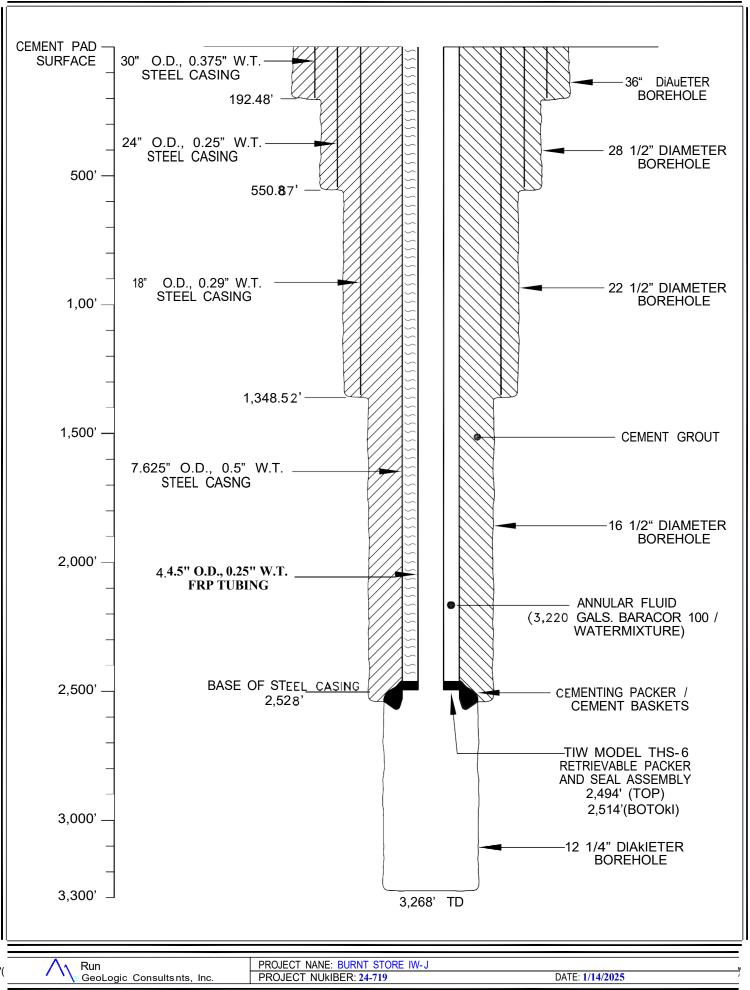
SCHEMATIC DIAGRAM SHOWING CCU BURNT STORE INJEC" TION WELL IW-1 CONSTRUCTION DETAILS.
